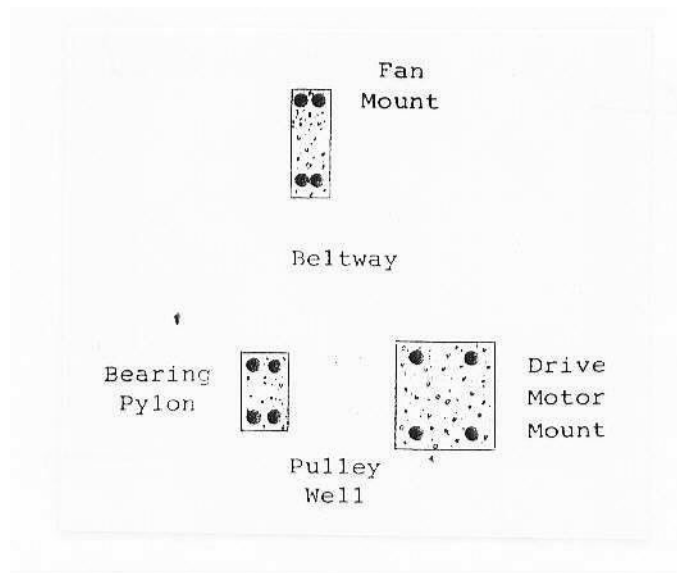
The plan view depicts a typical concrete foundation for a ventilation blower and its drive motor. Source: Author.
